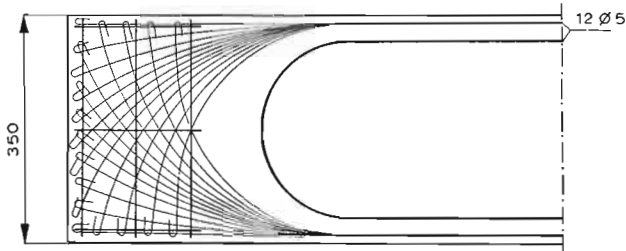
Diagram of the prestressed slab at Wexham Springs (perimetral cables)
